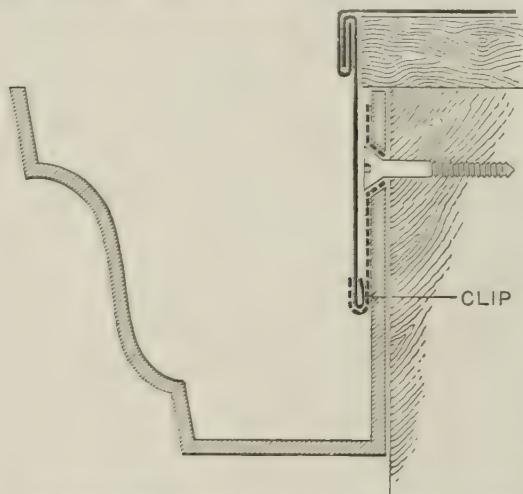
Copper Flashing into Iron Gutter (one-half full size)
